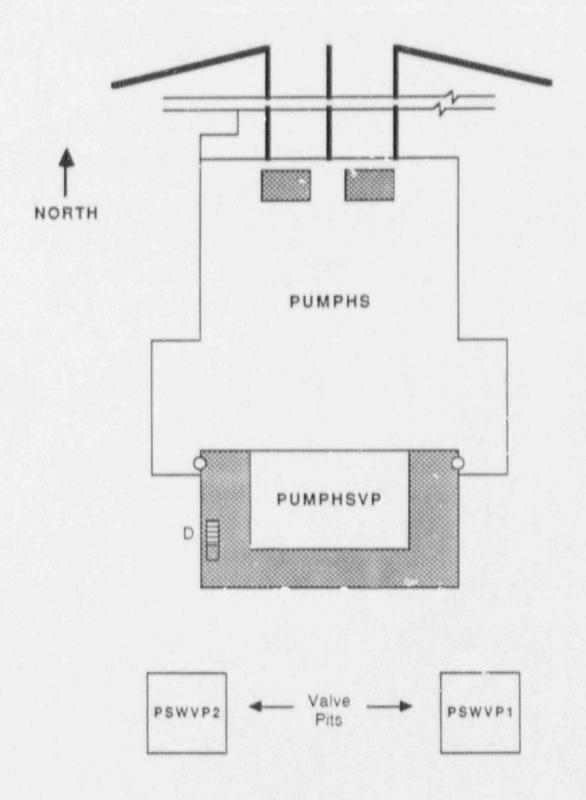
Hatch Units 1 & 2 Intake Structure Building Arrangement
